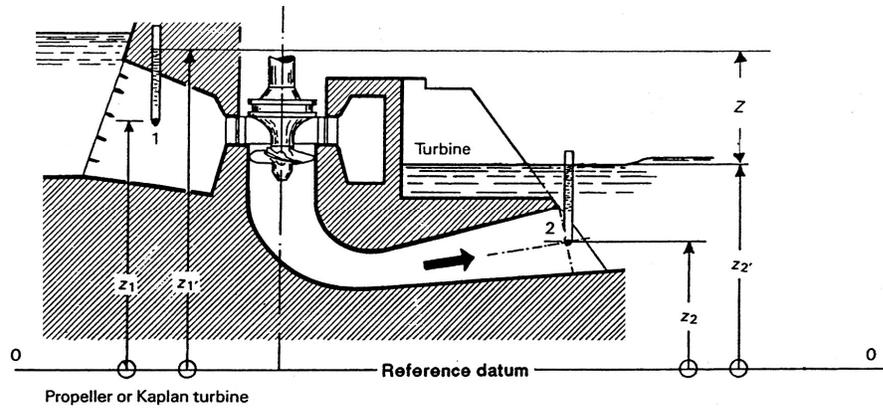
Transverse section through typical Kaplan unit (from IEC 600041)
